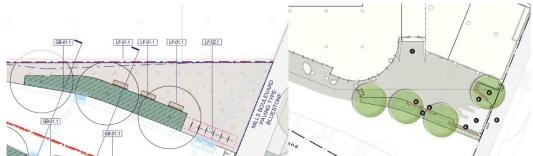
Excerpt from endorsed Nelmoore Lane landscape plan (left) ad proposed Nelmoore Lane landscaping plan detail (right)
